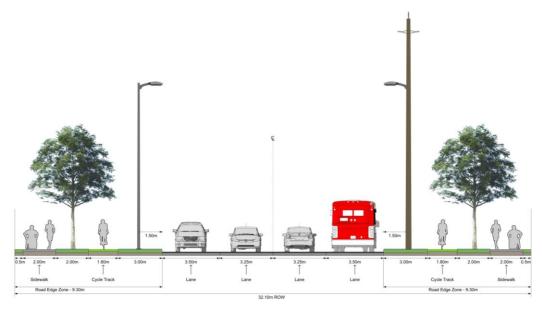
City of Ottawa Arterial Road Concept 2 - Separated Cycle Tracks / Sidewalks
